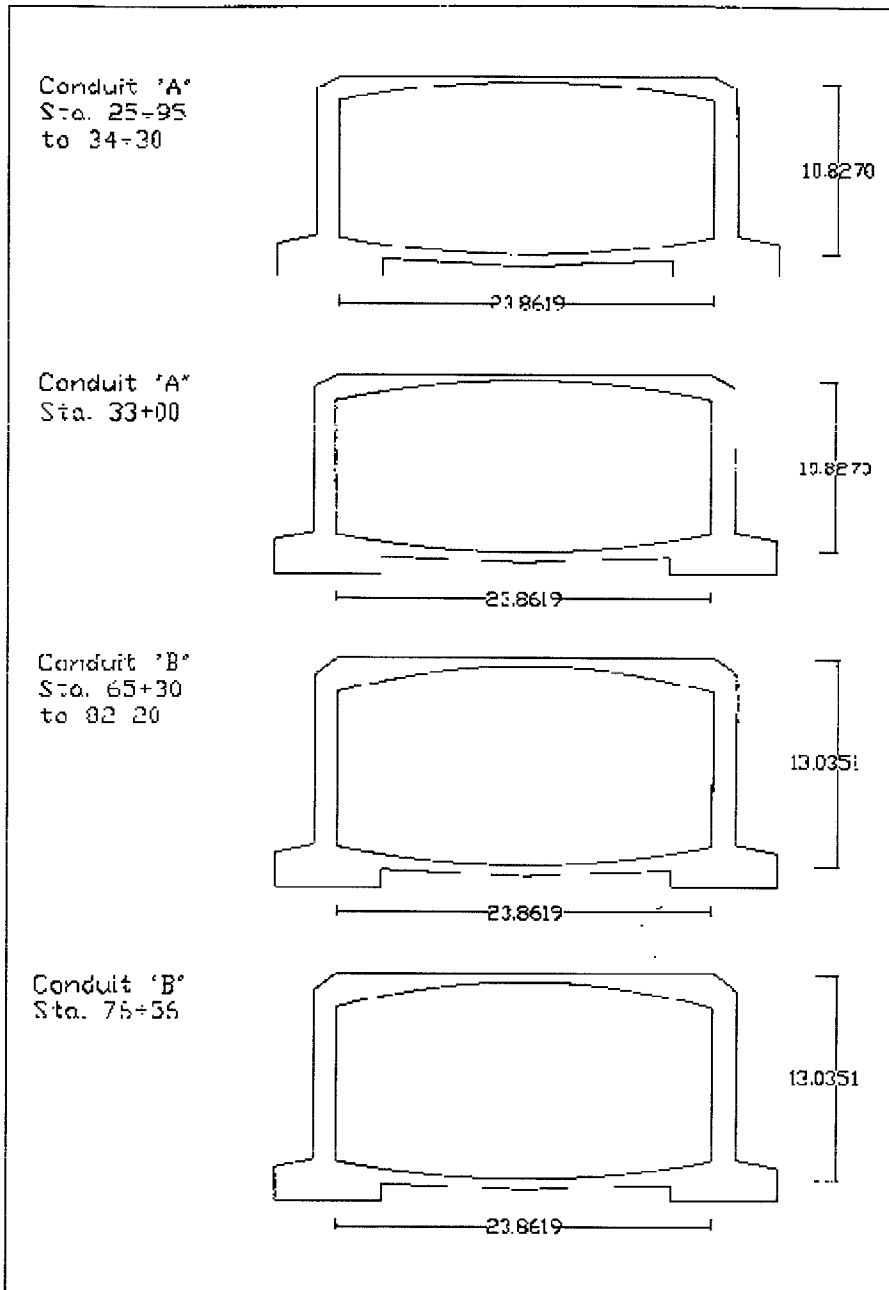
Representative Cross-sections of Closed Conduit Portions of the American Canal (Redrawn from original engineering drawings on file at IBWC).
